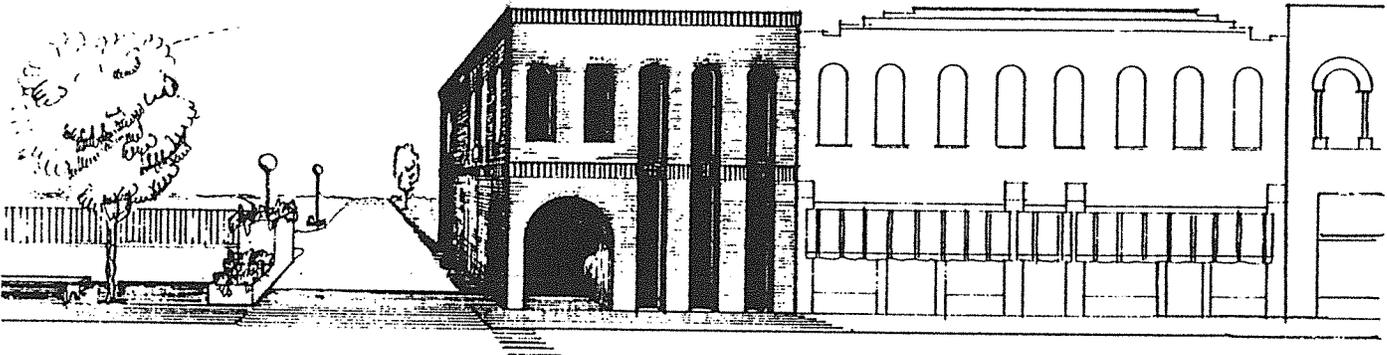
The height, width and window/door openings of this possible design for new construction in downtown Hot Springs are similar to its historic neighbors. However, people can still tell it is a modern building. (From *Historic Revitalization Hot Springs, S.D.*)
